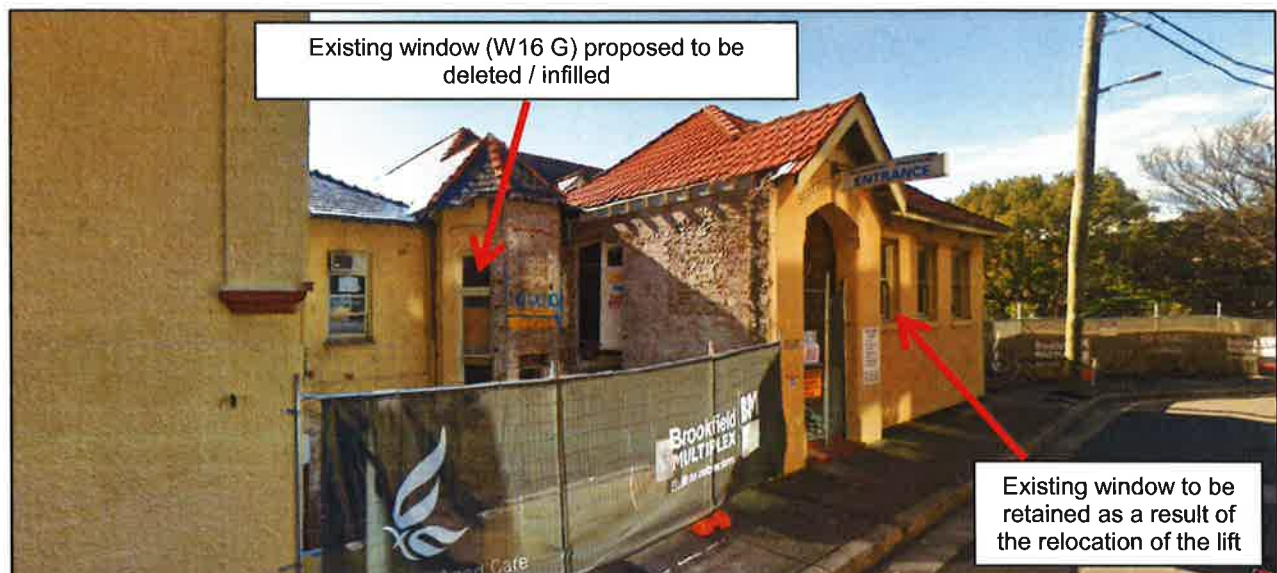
Southern elevation of the Scottish Hospital building viewed from Cooper Street, showing the existing window arrangement with the bay window feature on Level 6 (Source: Google)
